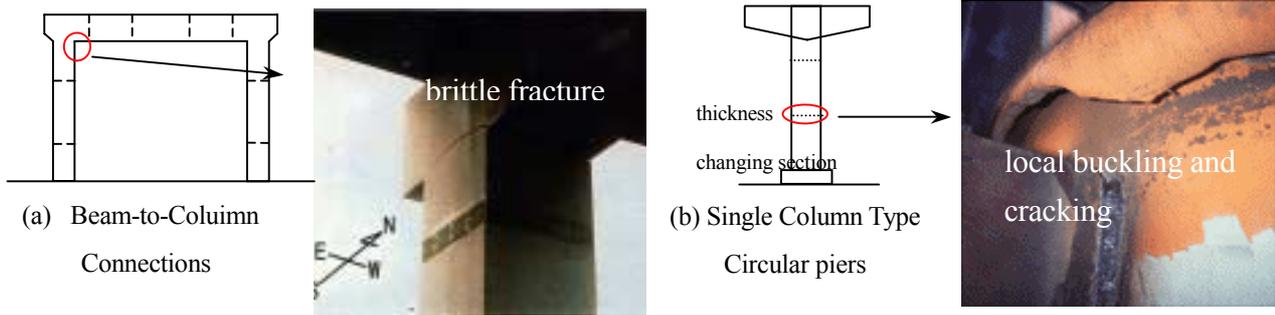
Cracks occurred in Steel Bridge Piers during the Kobe Great Earthquake
